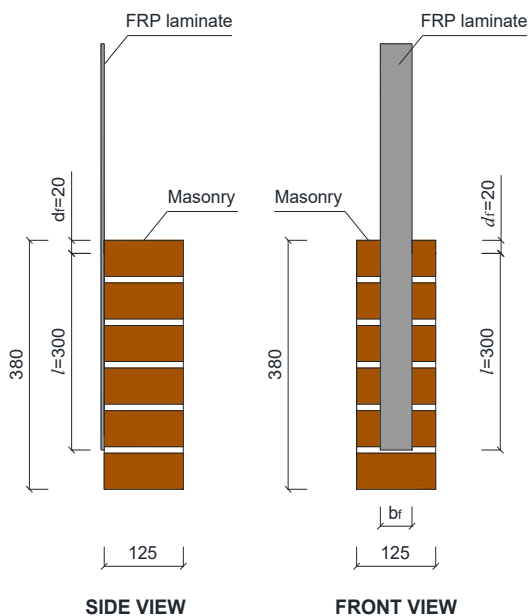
Specimen Dimensions and Details of Bonded FRP system (FRP-to-masonry specimens). Dimensions in mm.
